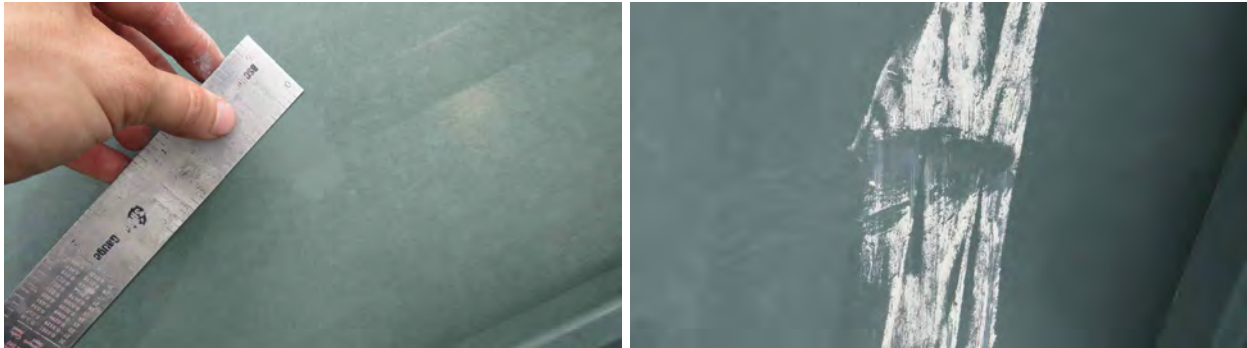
Roofing on the student center (13) with no hail damage.
